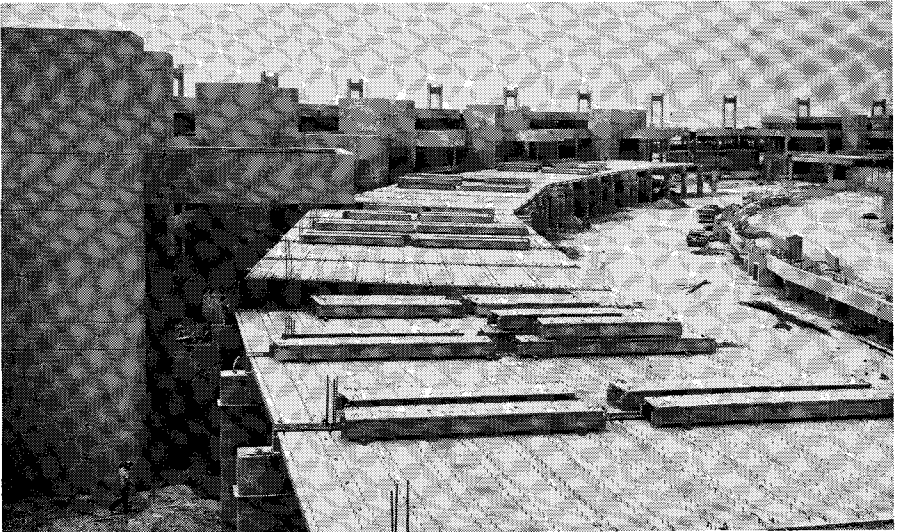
Deplaning traffic circulates on roadway adjacent to structure. Intermediate ramps provide connection to service roads.
